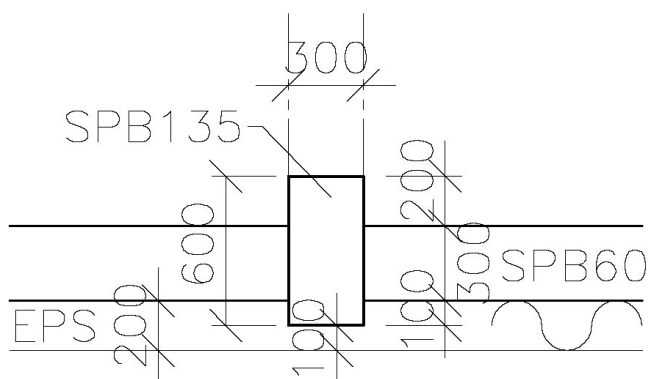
Solved detail of horizontal cross section of column with thermal insulation and window sill made from slag-pumice concrete
